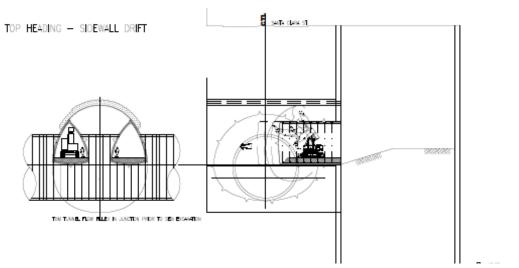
Cross Cut Excavation - TBM First - Top Heading Side Drifts
